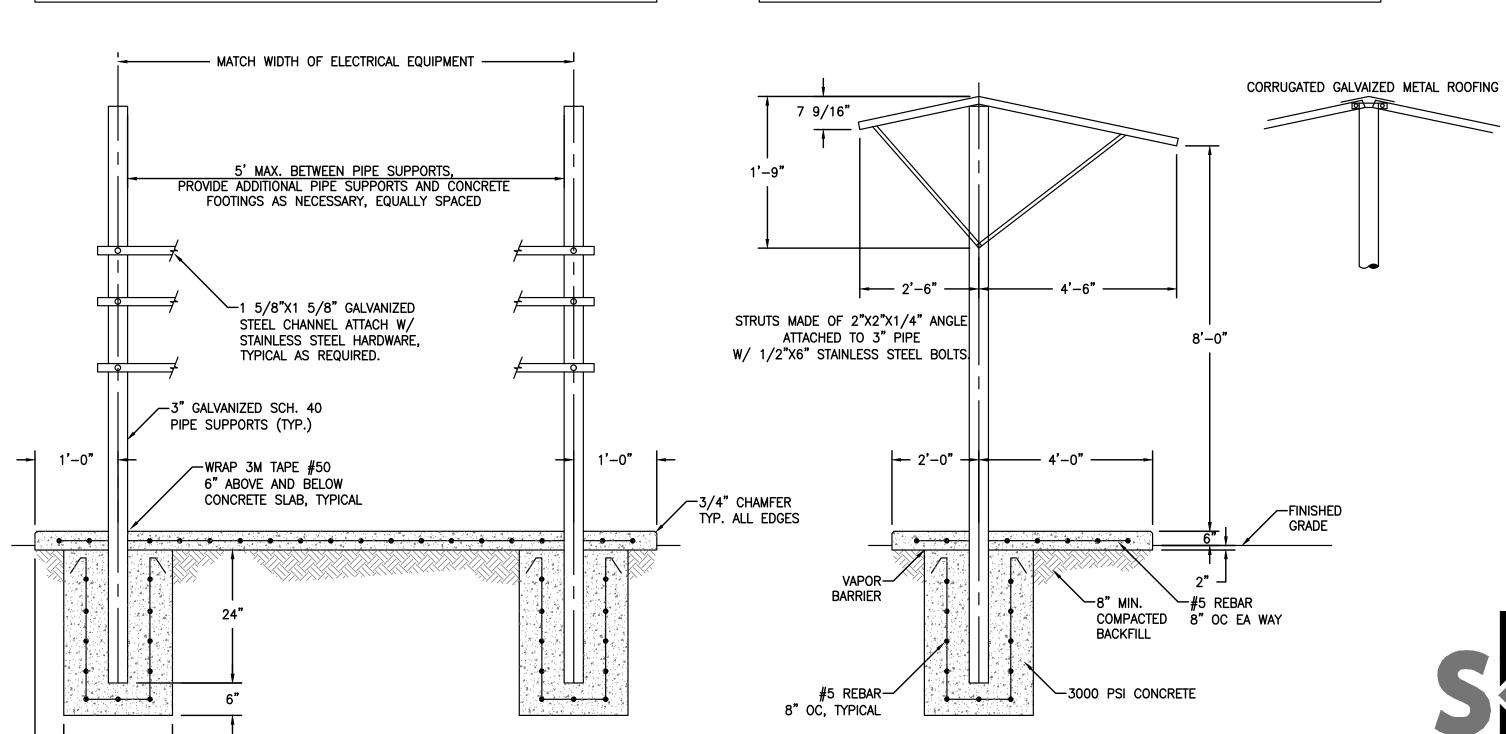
DETAIL - ELECTRICAL EQUIPMENT INSTALLATION - TYPICAL SCALE: NTS
